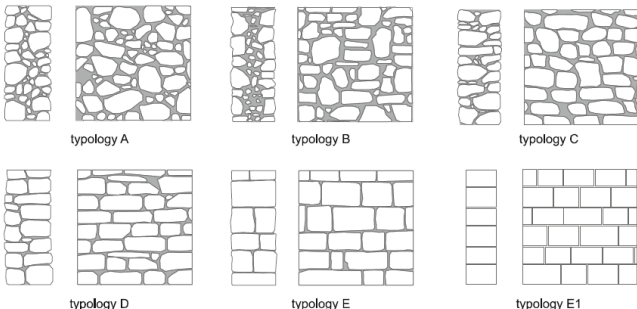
Stone masonry typologies: sketches of typical textures and cross-sections
